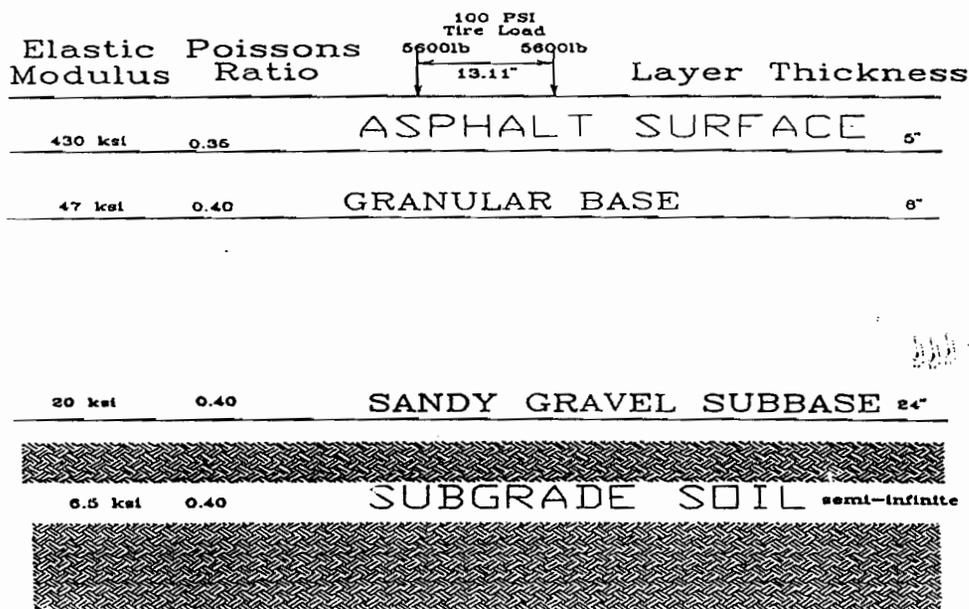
Typical Cross Section of Pavement Structure for the State of New Hampshire
